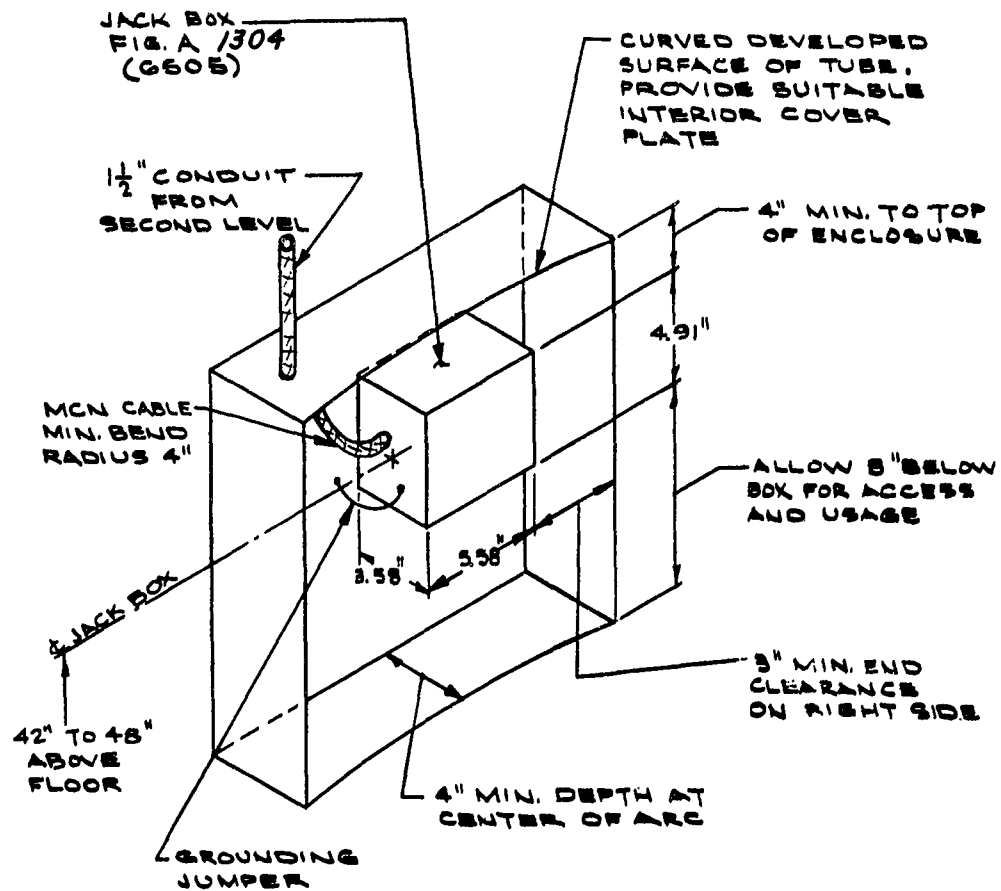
Mounting Detail LF Sump Pit Jack Box
